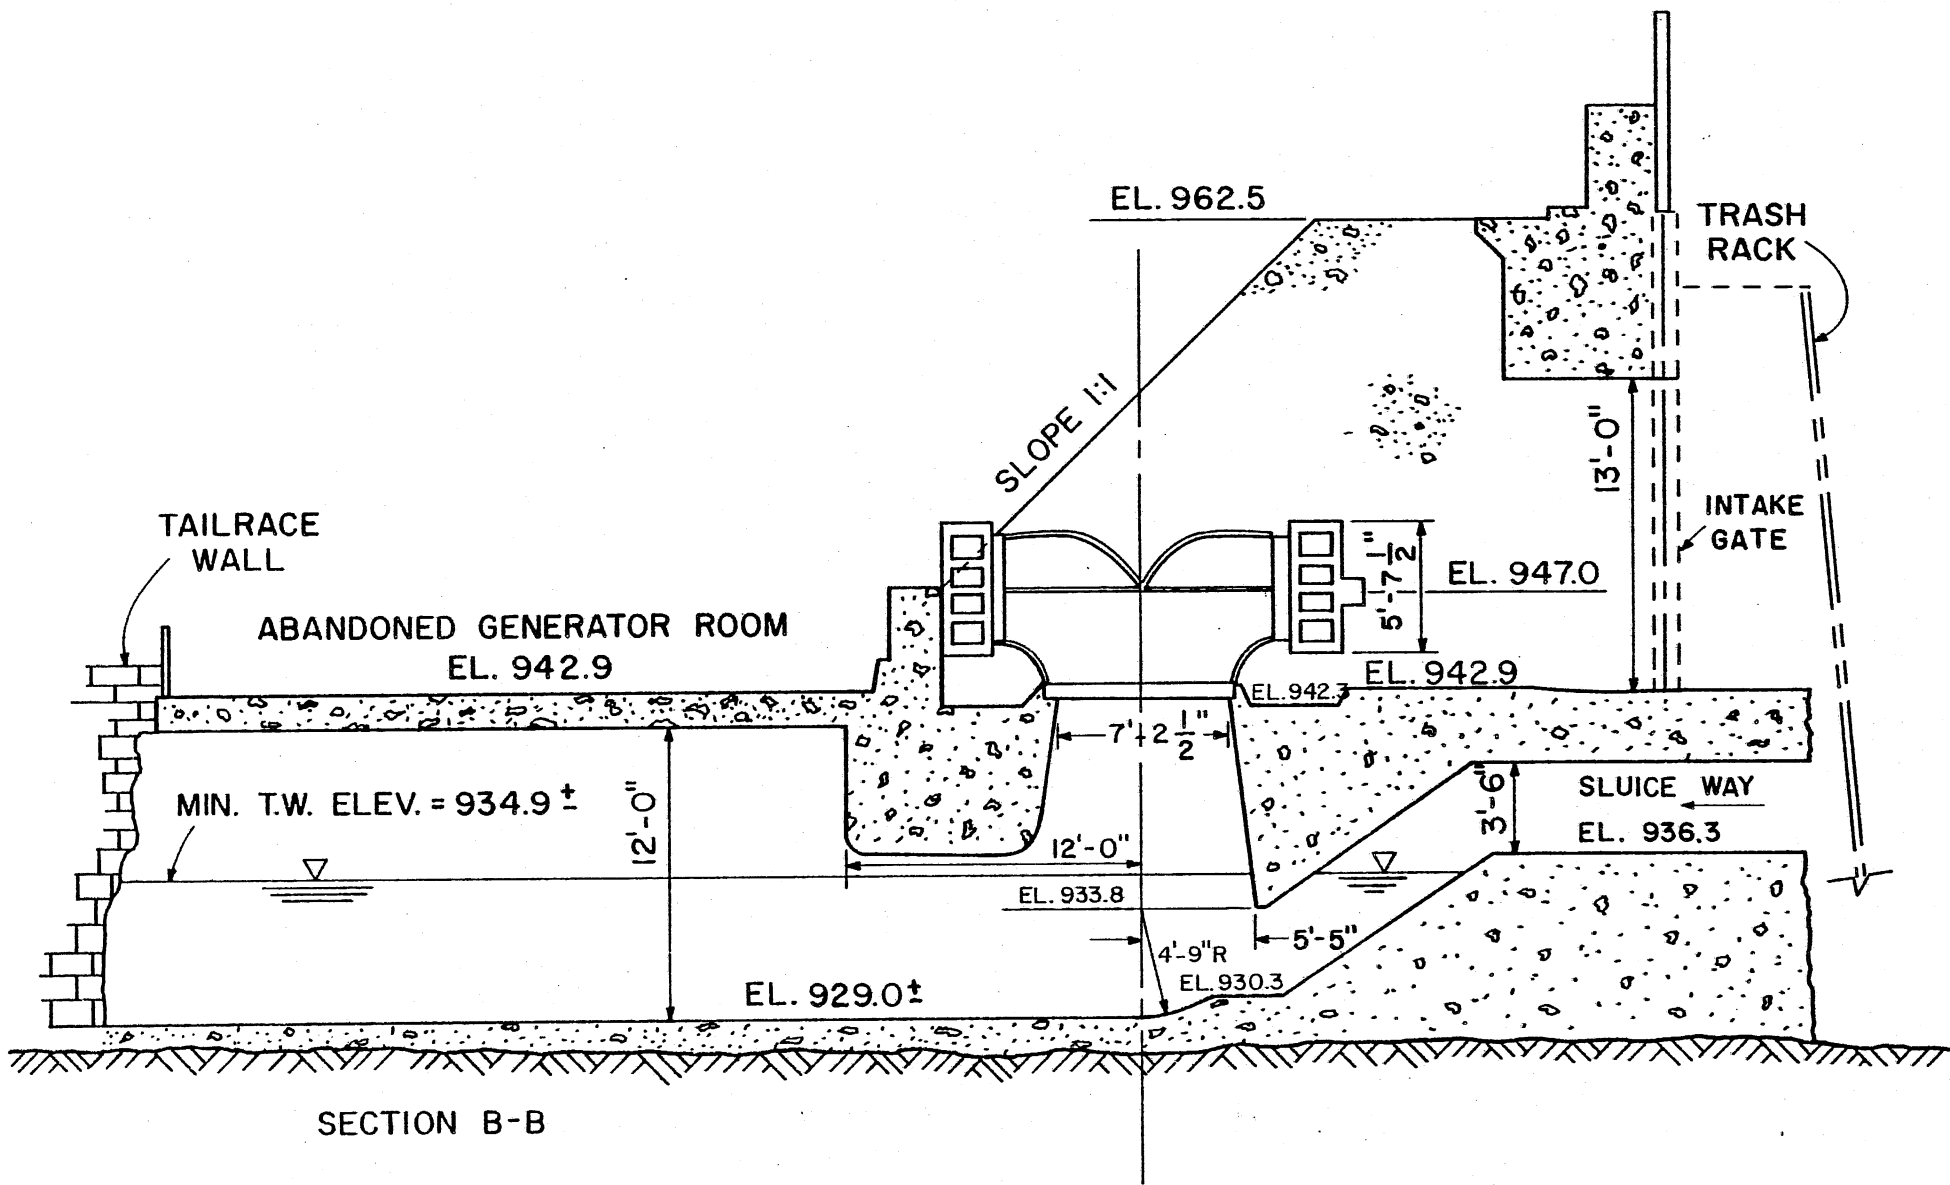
Plan of Existing Powerhouse and Spillway at the Kettle River Dam.
